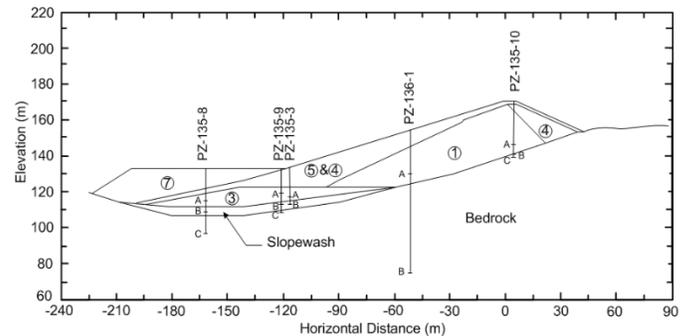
Geologic cross-section of San Luis Dam and location of piezometers installed after the 1981 slide (after Stark 1987).
